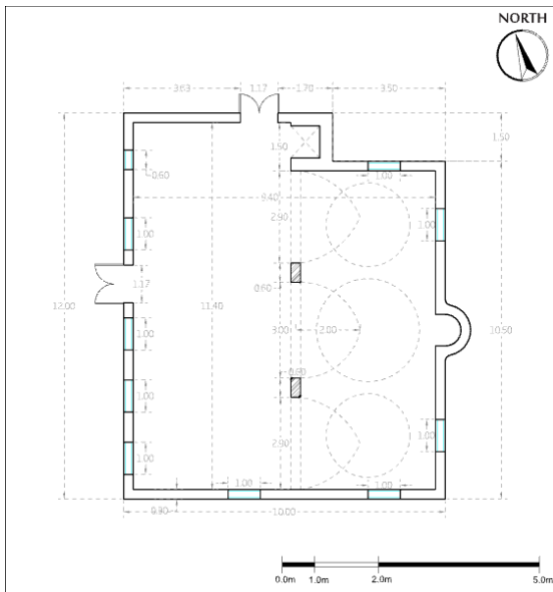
Ground floor plan of Al Jilani Zawiya. (Source: Author, 2024)
